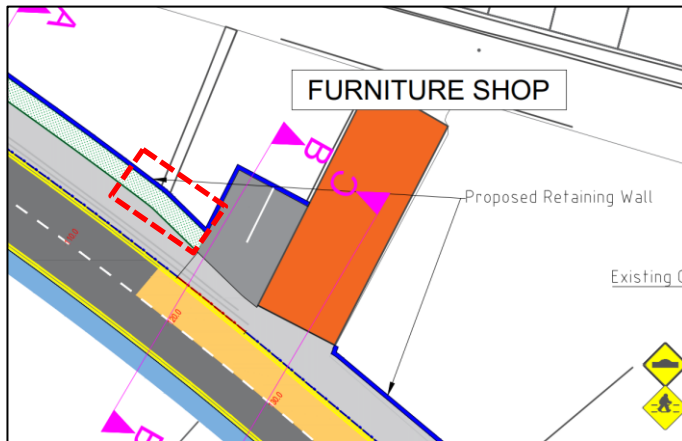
Existing Walkway within Grass Area (Dwg No. 11199-3-005 Rev B)
